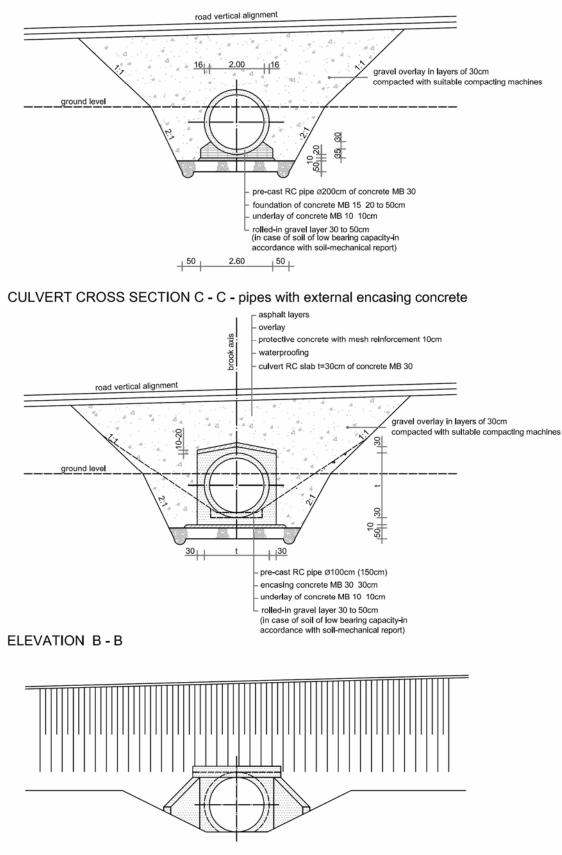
Cross section and elevation of pipe culvert without and with encasing concrete at pipe exterior
